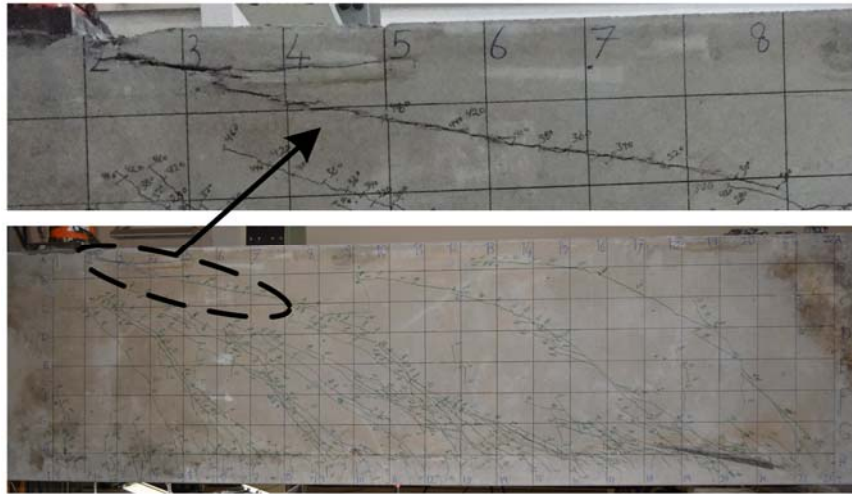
Failure of beam SFRC48a and widening of the critical crack in the compression zone
